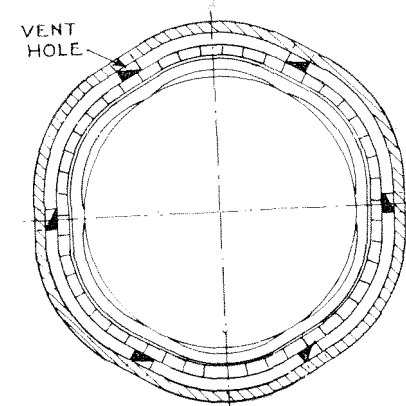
Cross Section of Bottom of Chimney. Built in 1910.
